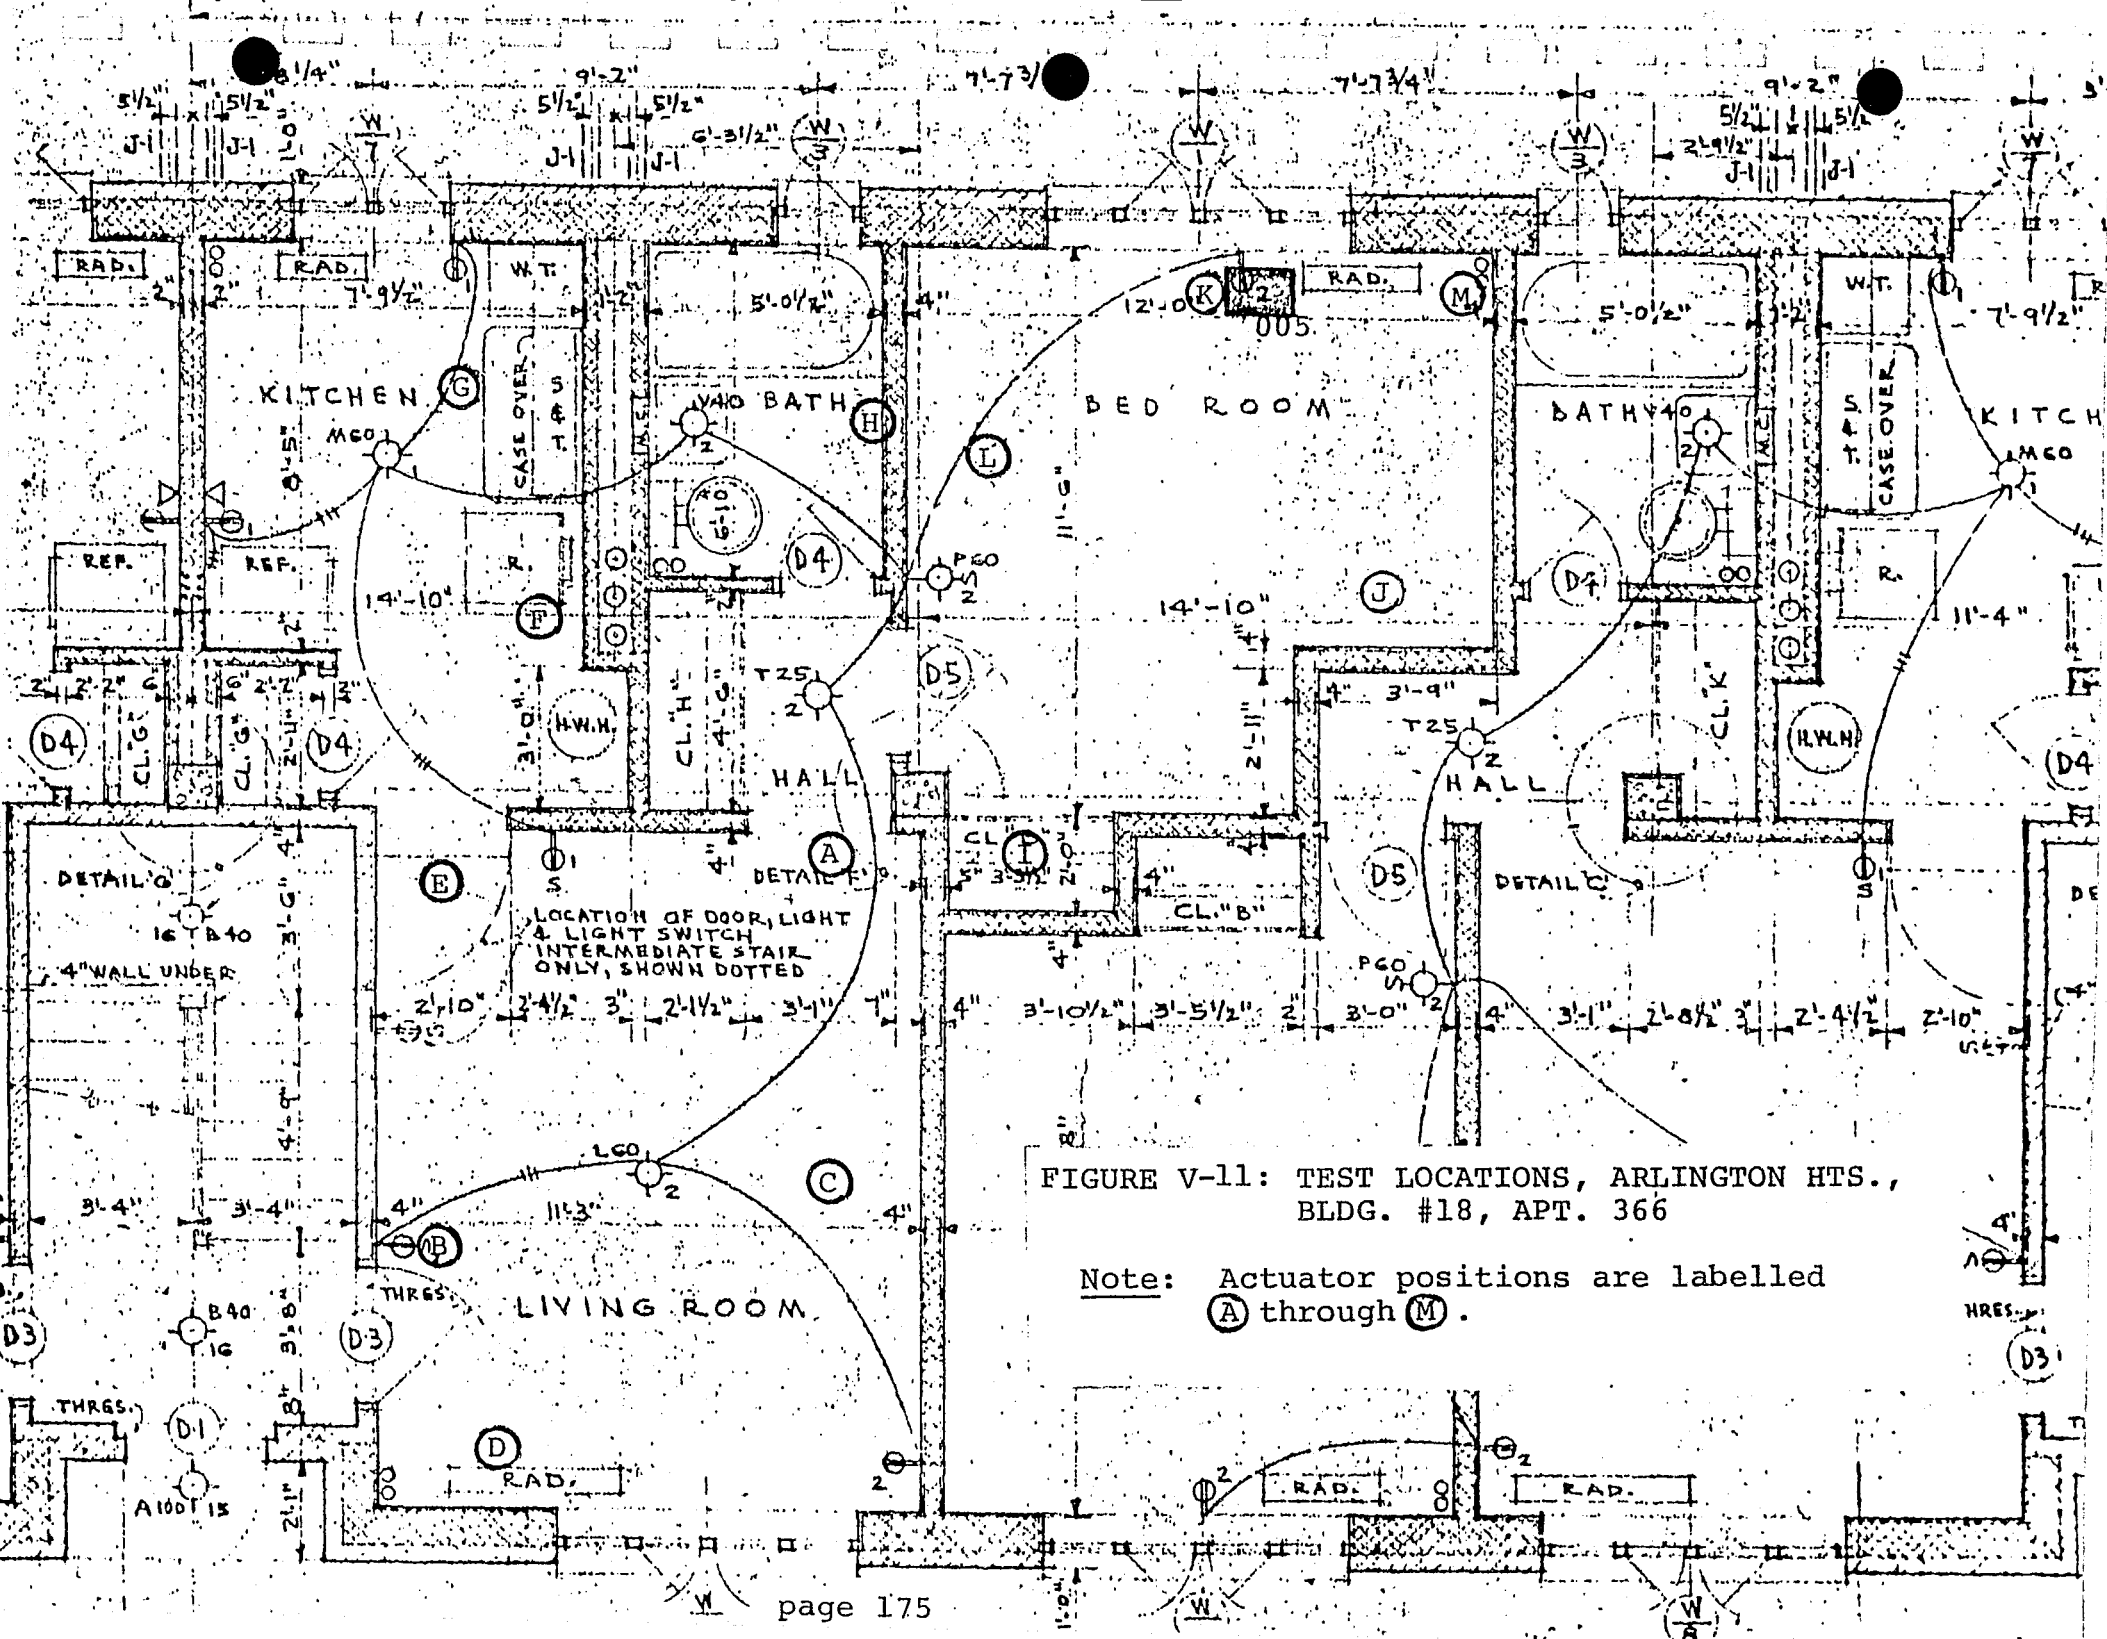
TEST LOCATIONS, ARLINGTON HTS.,
